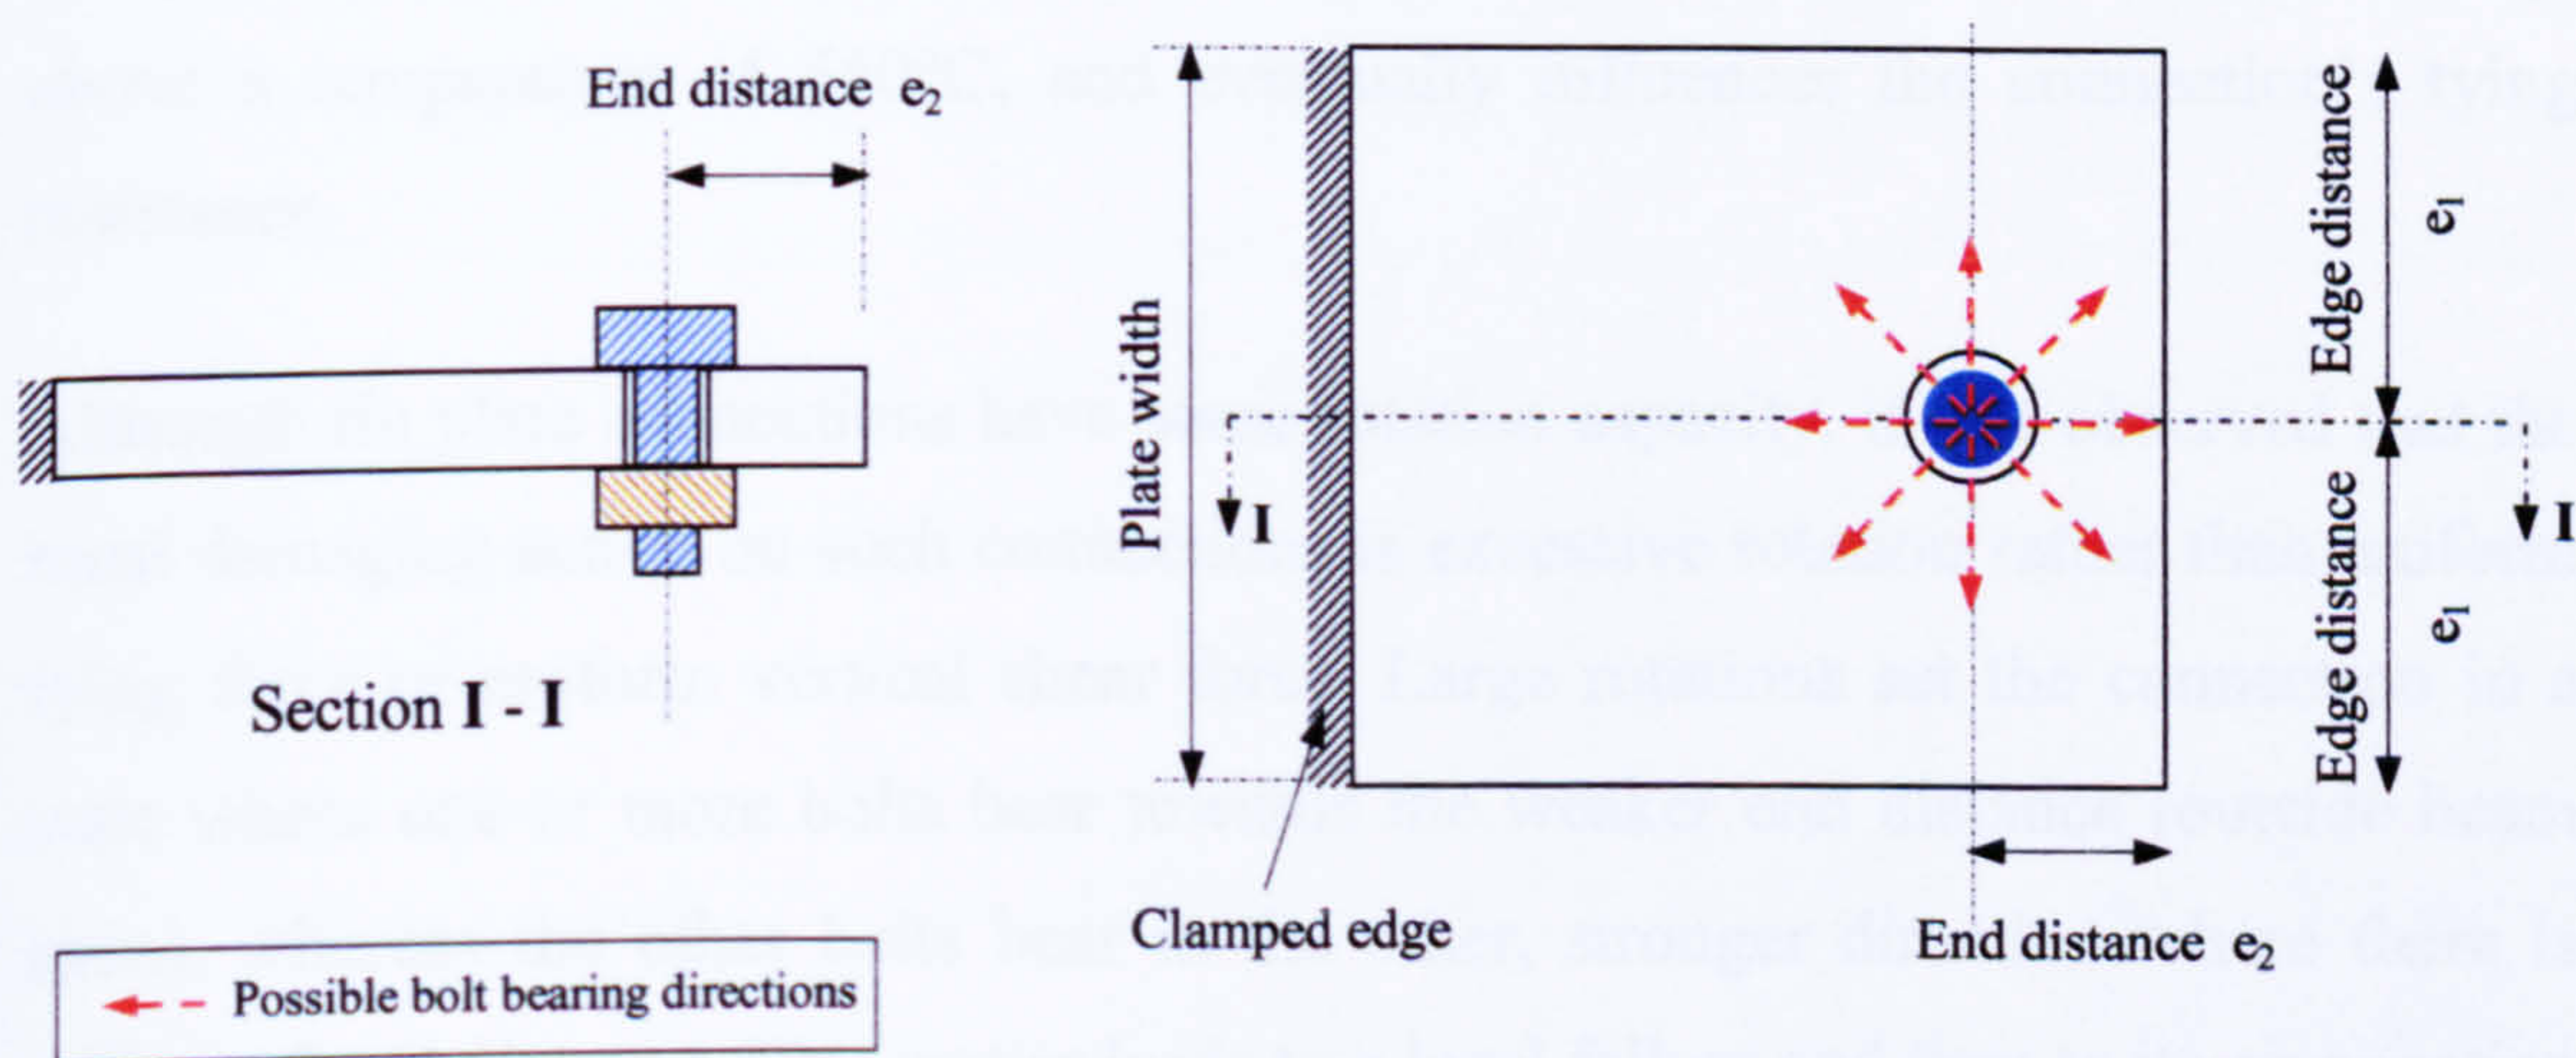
Geometrical detail of bolt bearing into plate hole
